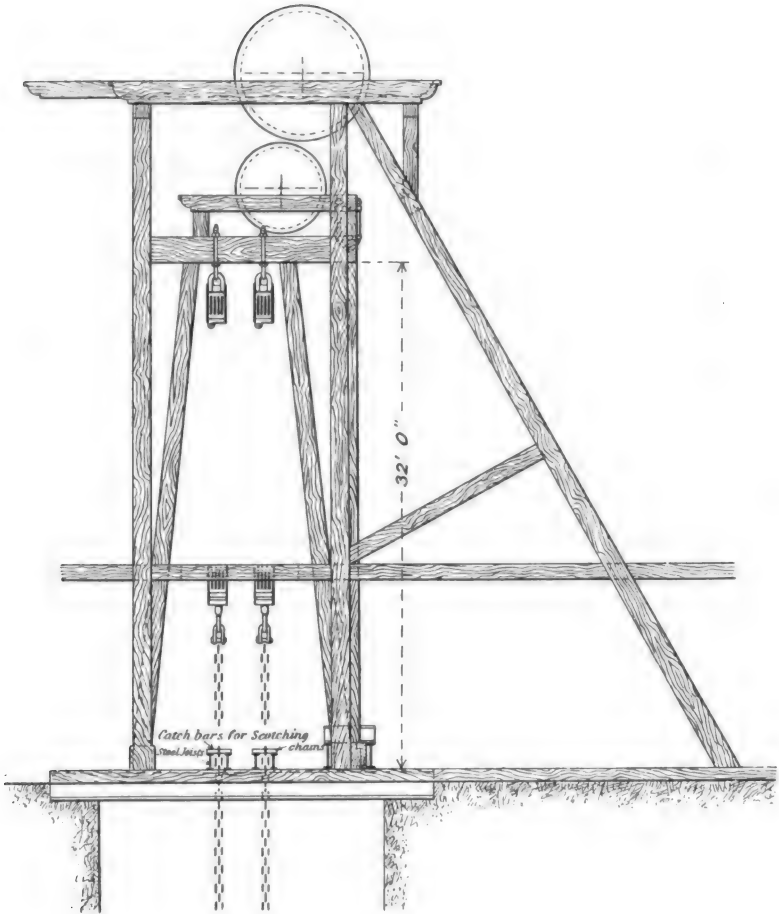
Manner of suspending Evans' Sinking Pump. Surface Arrangement.
